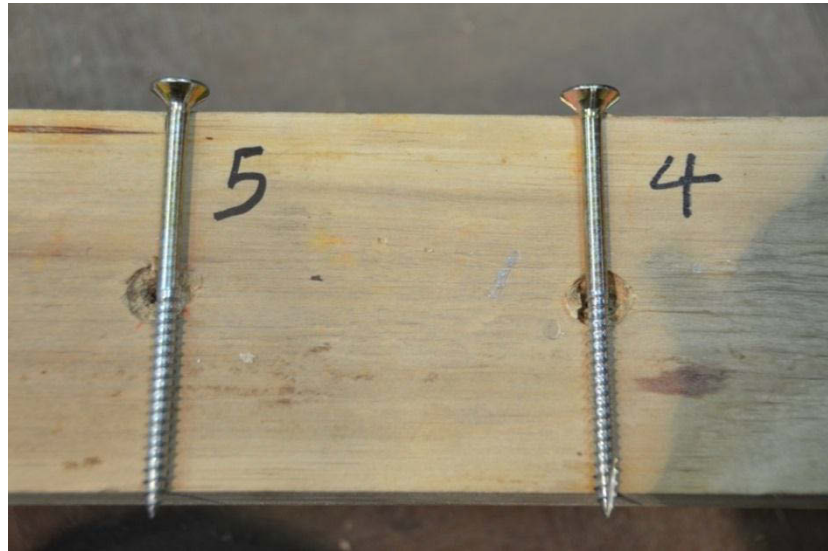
Deformation of the screws after completing the test of LVL beam (with 100mm screw spacing)
